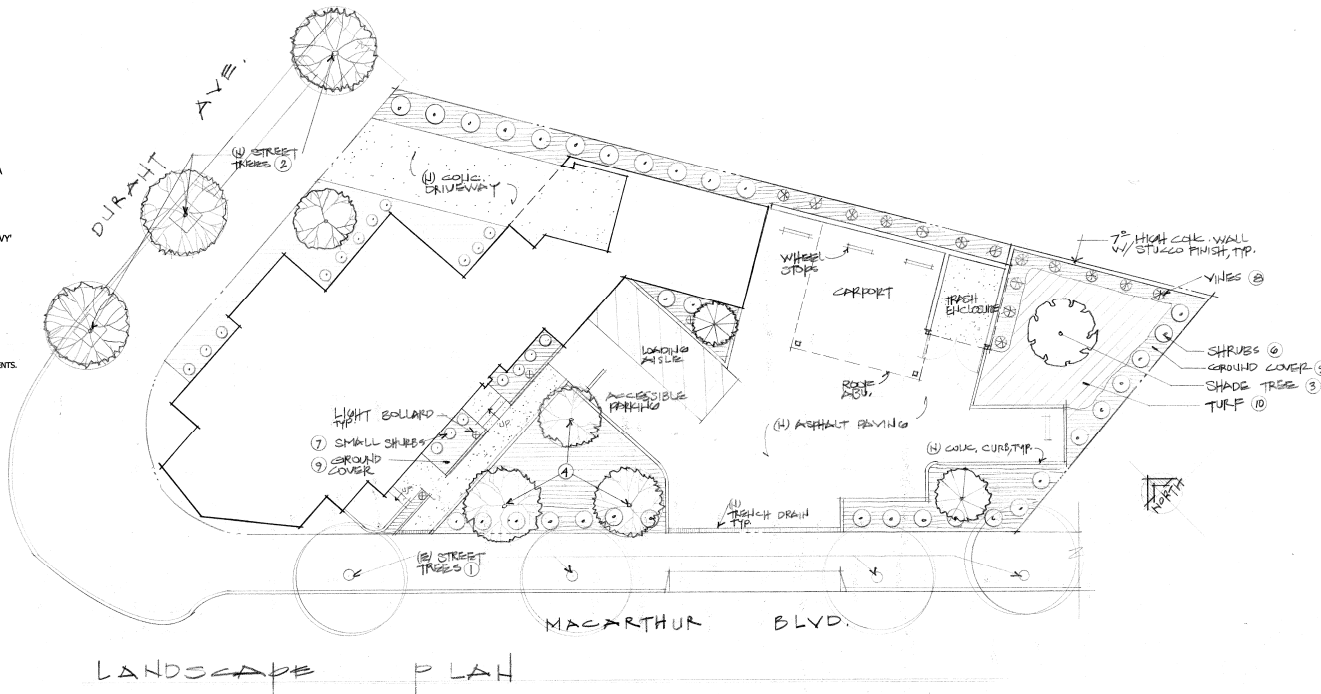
EXHIBIT E – CONCEPTUAL LANDSCAPE PLAN
